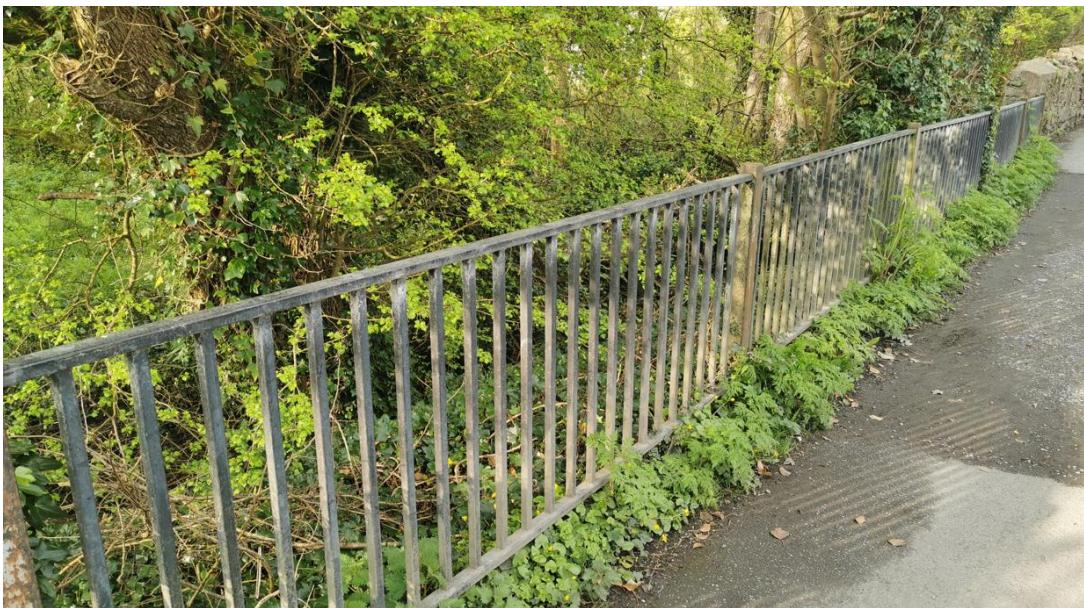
Existing railing between Bridge 2 and Bridge 3
